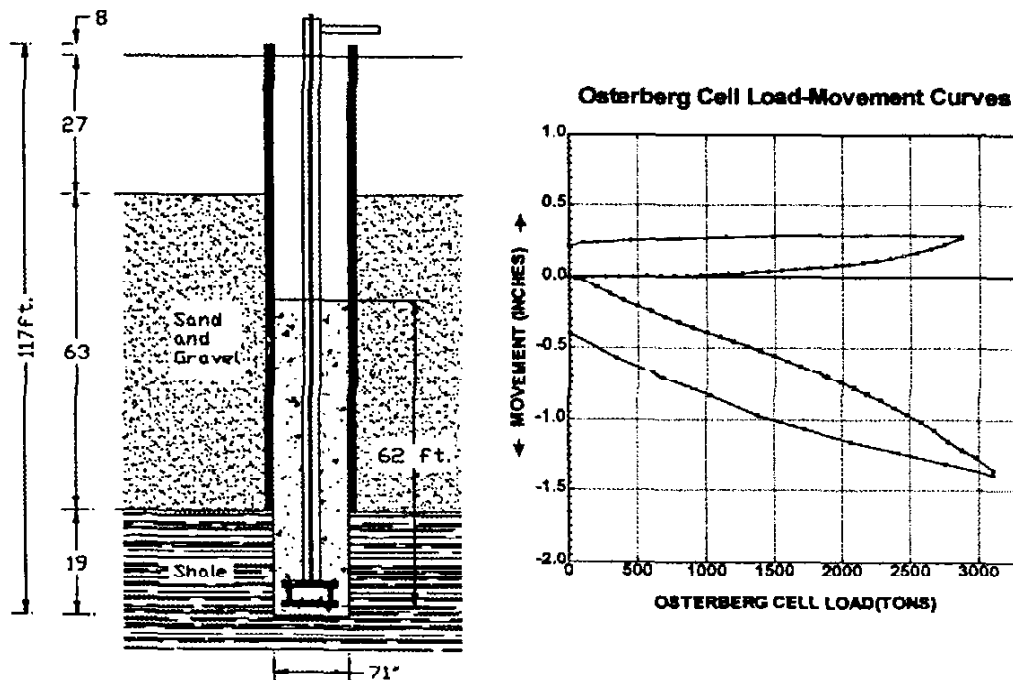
Test Shaft for Bridge in Owensboro, KY
